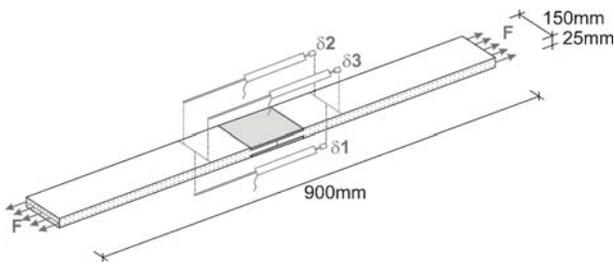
Geometry of specimens for the tensile tests, configuration of measuring devices [11]
